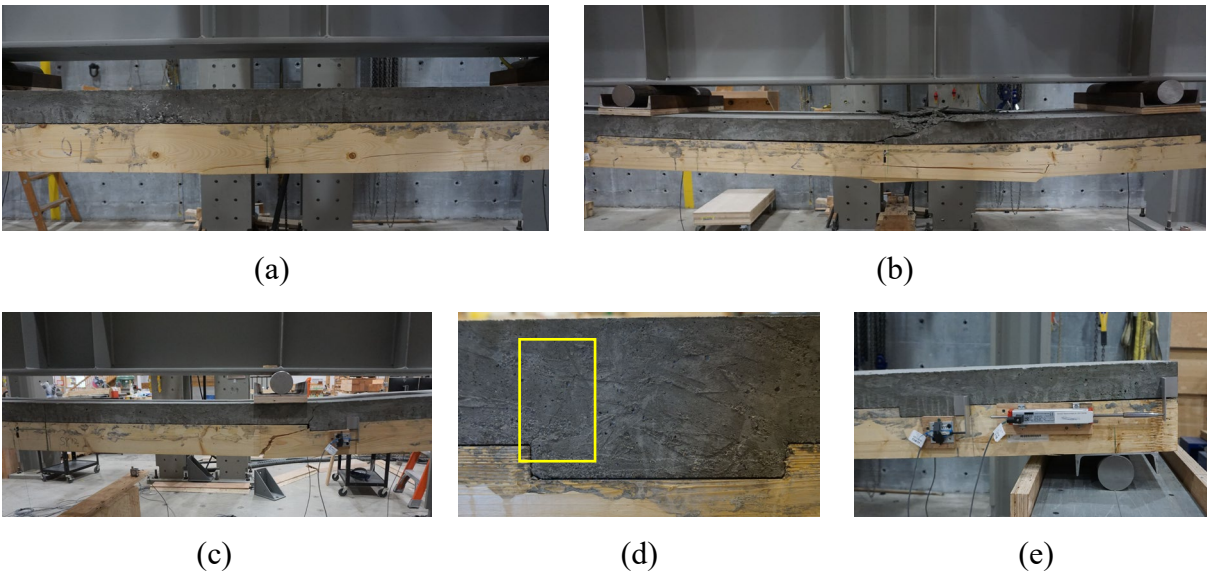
Typical failure modes of reinforced composite floors under bending (a) Bending failure of timber at the bottom of specimen SPR-1; (b) Bending failure of timber at the bottom and concrete crushing at the top of specimen SPR-2; (c) Bending failure of timber at the bottom of specimen SPR-3; (d) Concrete cracking in the notched region in specimen SPR-1; and (e) End slip of specimen SPR-2 after failure.
